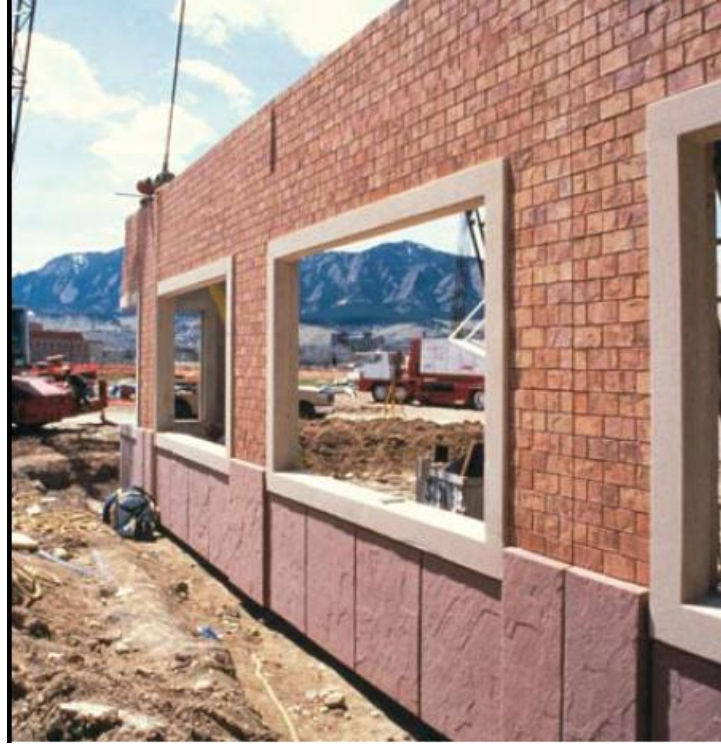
Solid wall panels (from Precast/Prestressed 2007, by permission)
